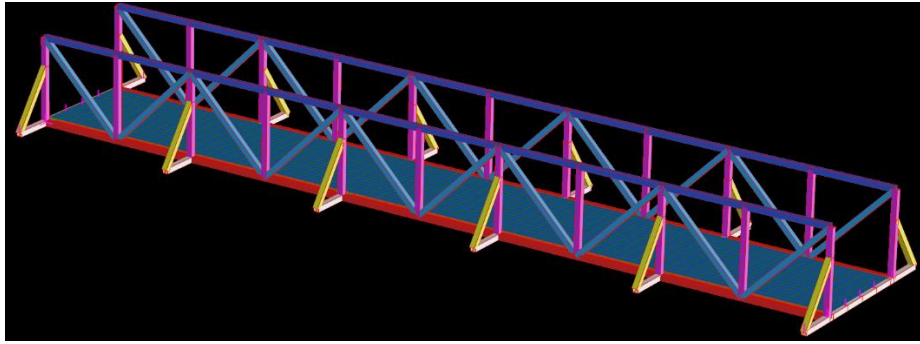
Strand7 View of JC Slaughter Falls Bridge
